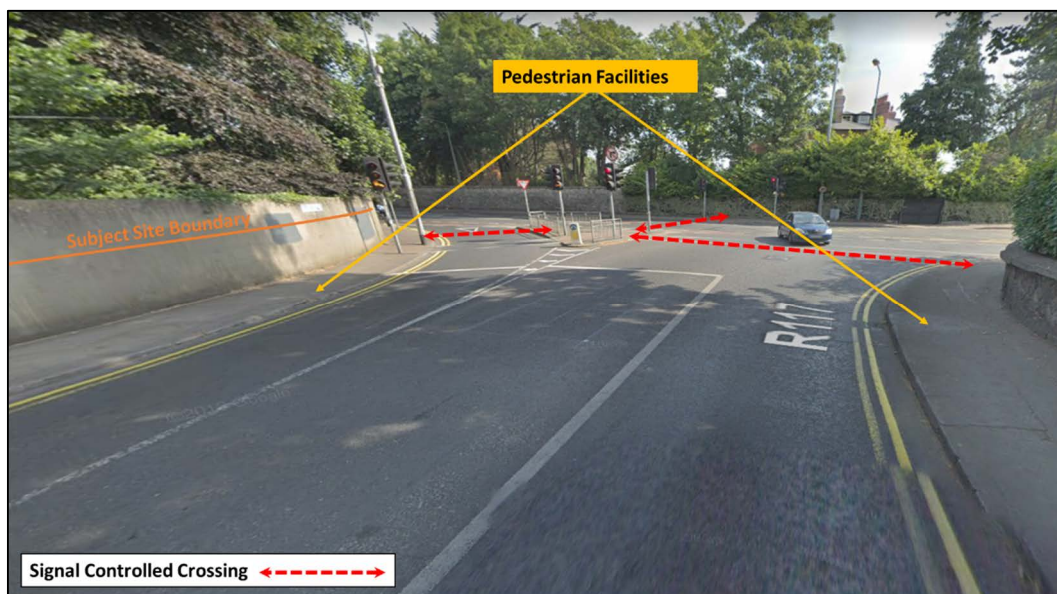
Existing Pedestrian Facilities along Milltown Road
